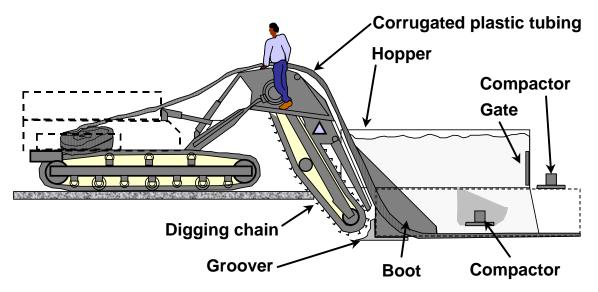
Automated equipment for installing pipe edge drains (NHI 1999).
